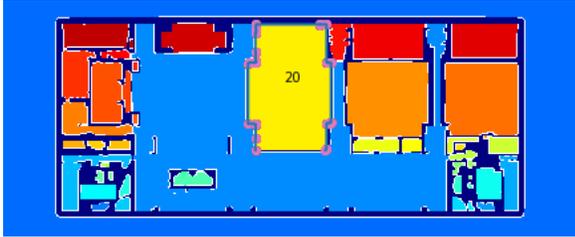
An analyzed floor plan with a room selected in AFPlan.
